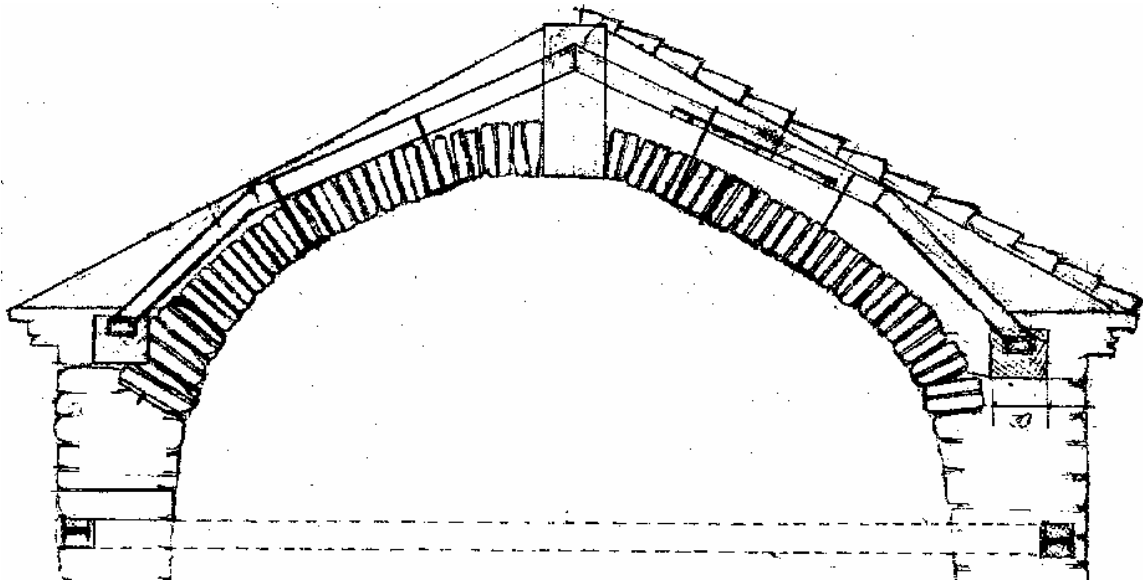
Strengthening of the damaged masonry vault by hanging it on the steel frame above
